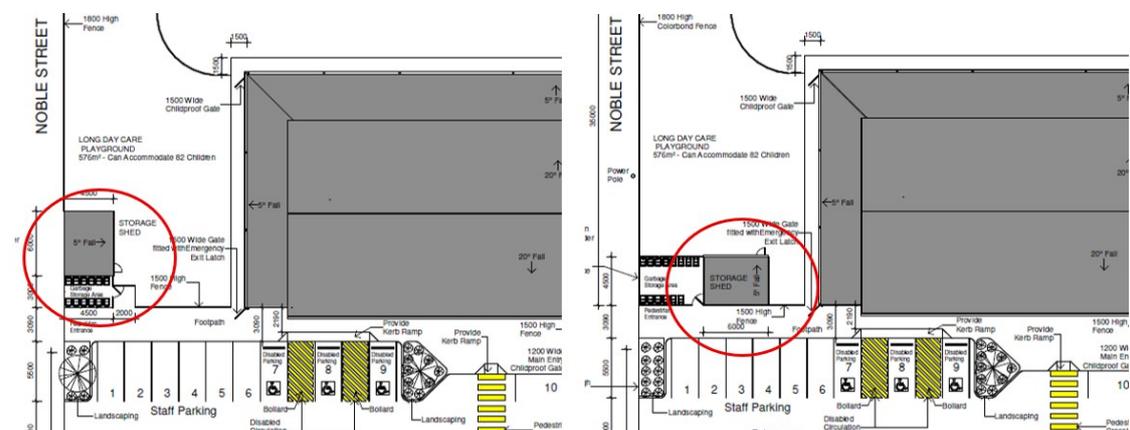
LEFT: Original Site Layout (part) and RIGHT: Amended Site Layout (part) (from submitted drawings by Highlands Design)
